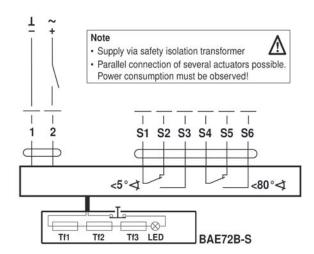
Wiring scheme of actuator BELIMO BF24-T
